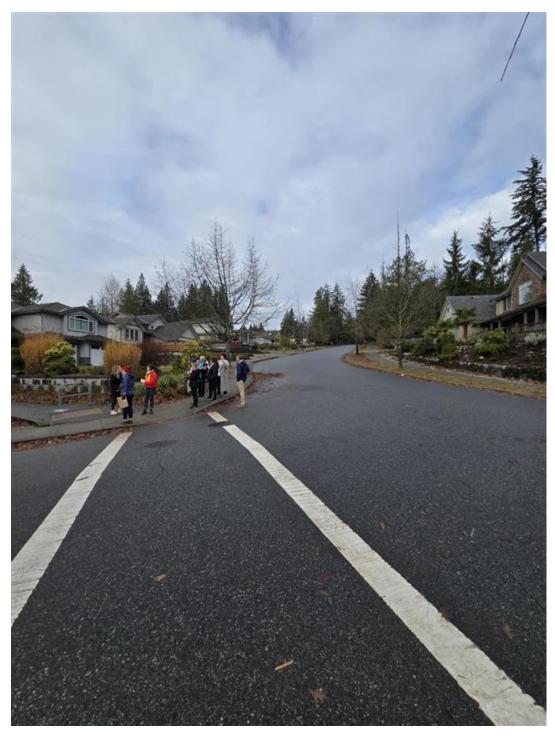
Existing Crosswalk at Intersection of Rajeena Way and Montana Road
